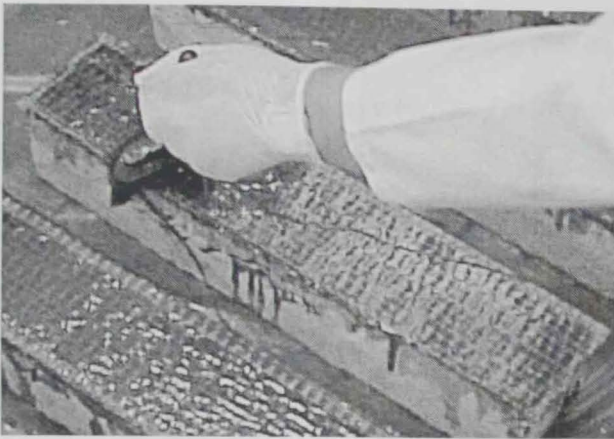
Fracture of the plain concrete beam.
